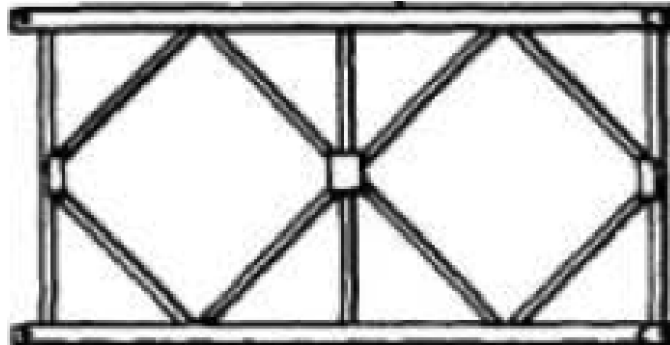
Detail of a Bailey Bridge Panel (Klaiber and Wipf 2004)
